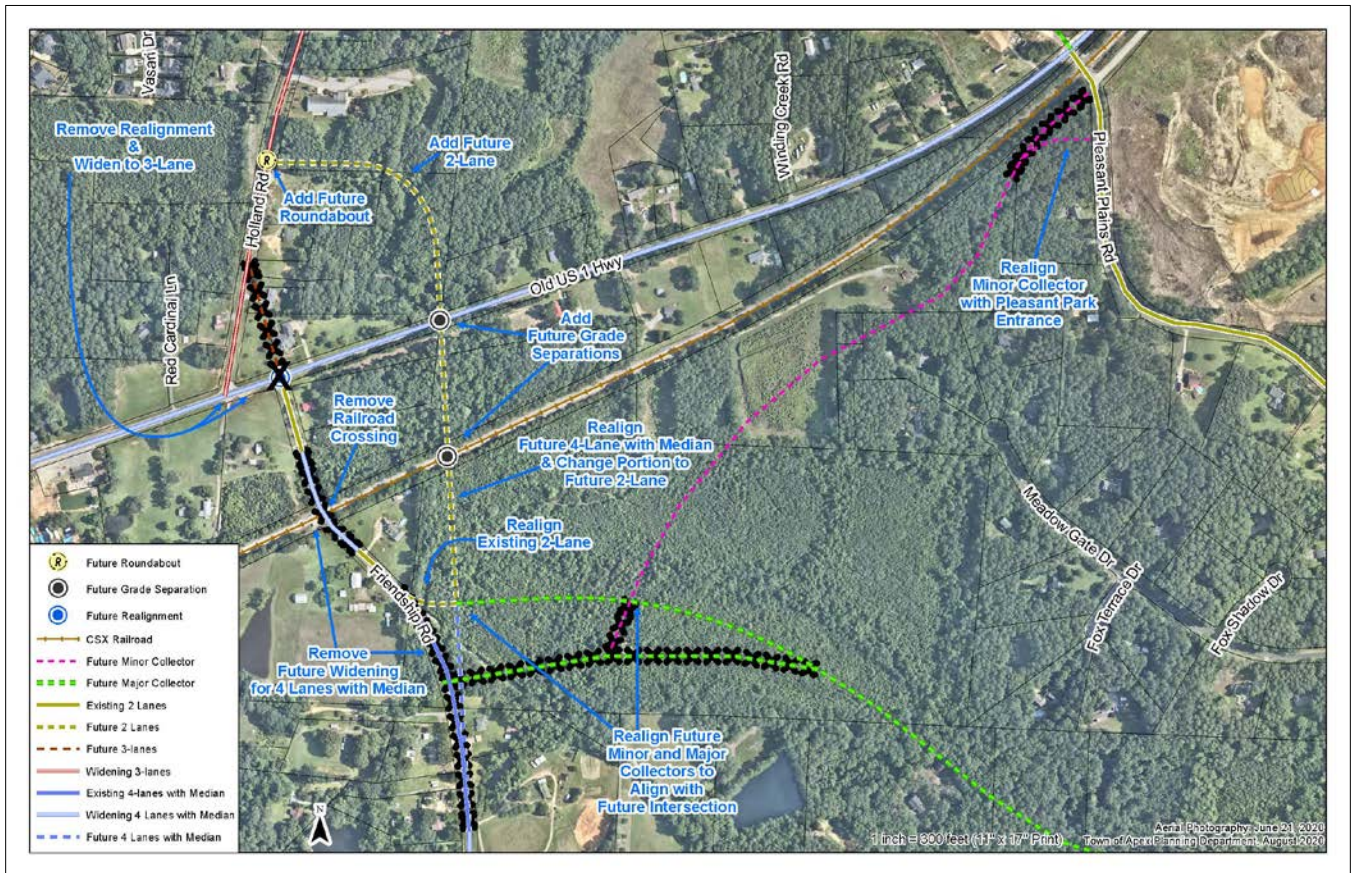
Proposed amendment to plans for Friendship Road and Holland Road at Old US 1 Highway – Alternative 2
